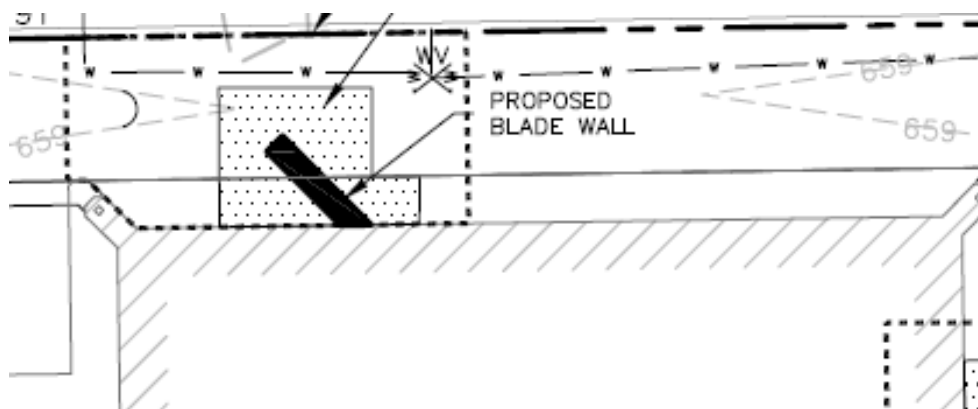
Close-up of Site Development Plan of the proposed new concrete around the Blade Wall that should be reduced, and additional landscaping provided
